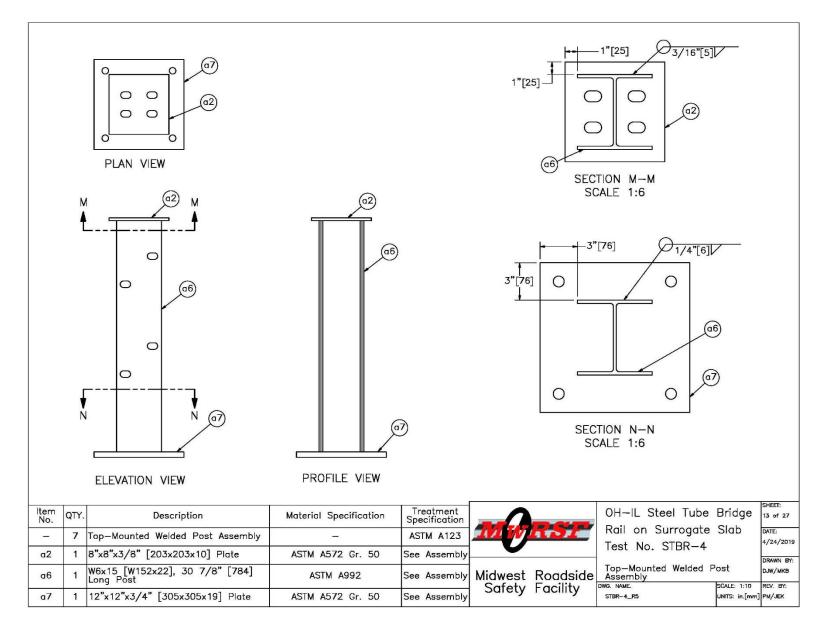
Top-Mounted Welded Post Assembly, Test No. STBR-4
